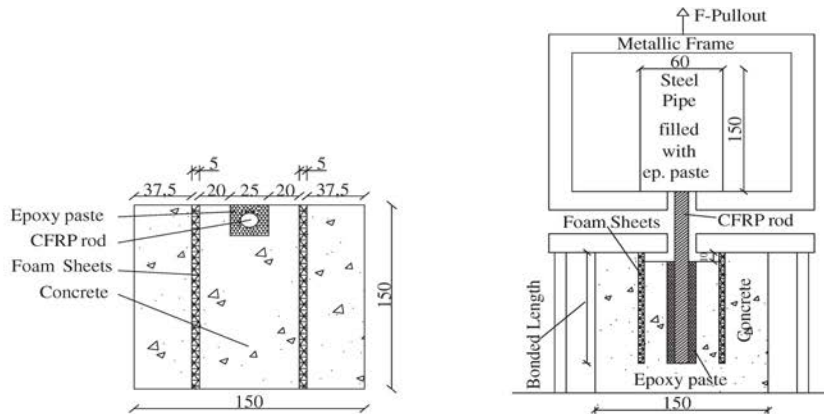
L-shaped pull-out specimen [101] (units in mm).
